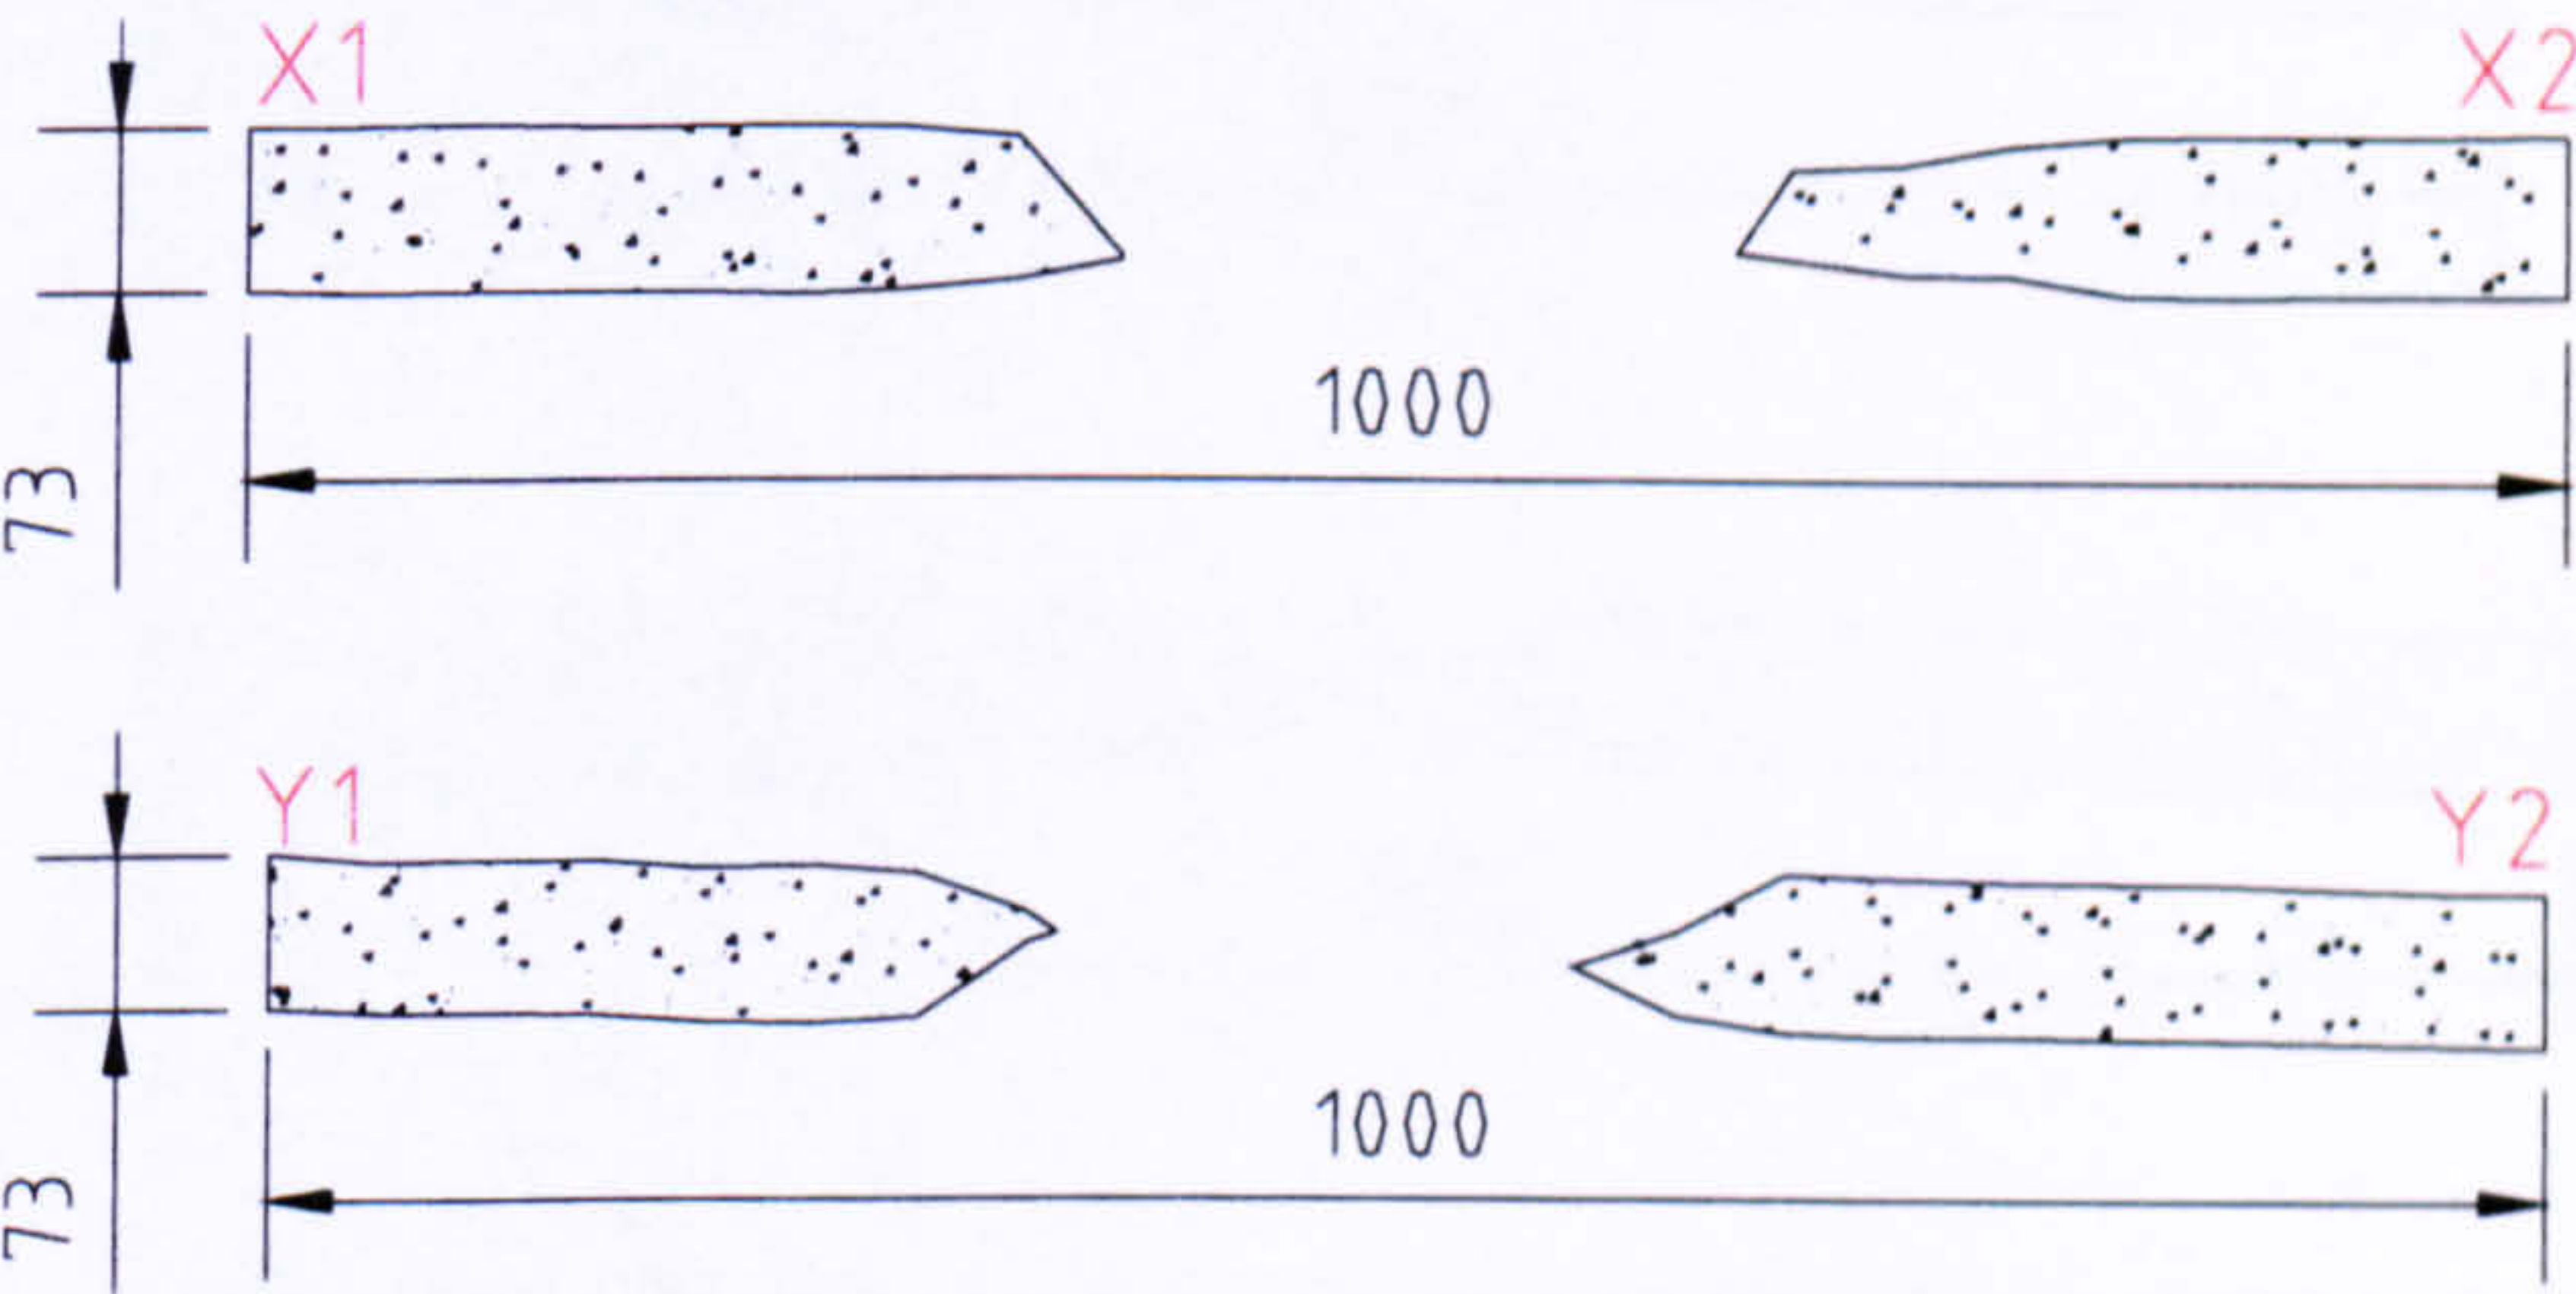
Cross-sectional elevation through X1-X2 and Y1-Y2 of secondary slab RCB73IT10
